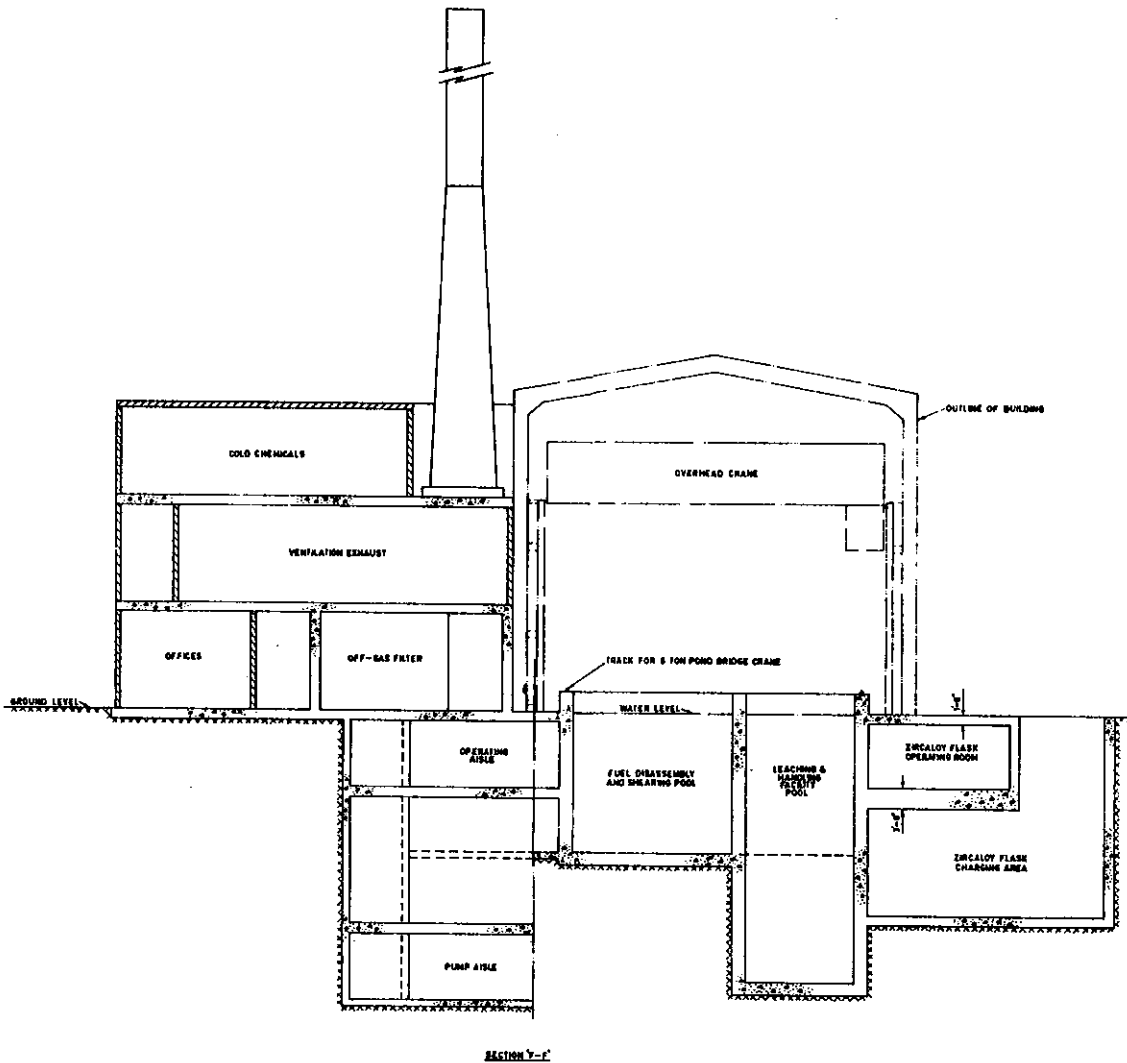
BUILDING LAYOUT - SECTION F-F
